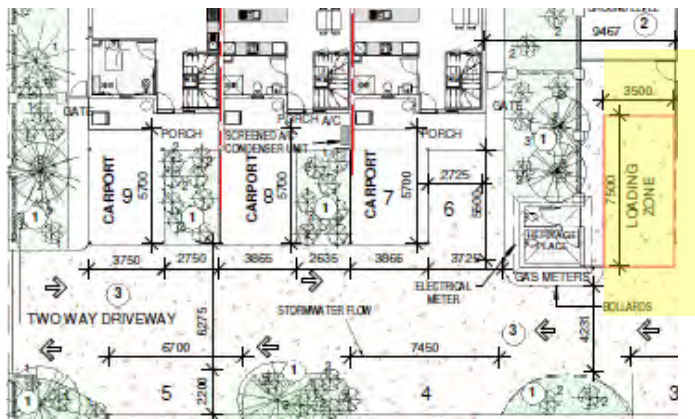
Garden bed and driveway, west of existing loading zone (highlighted yellow)- Endorsed Drawing No. PA2018/0224/A1
